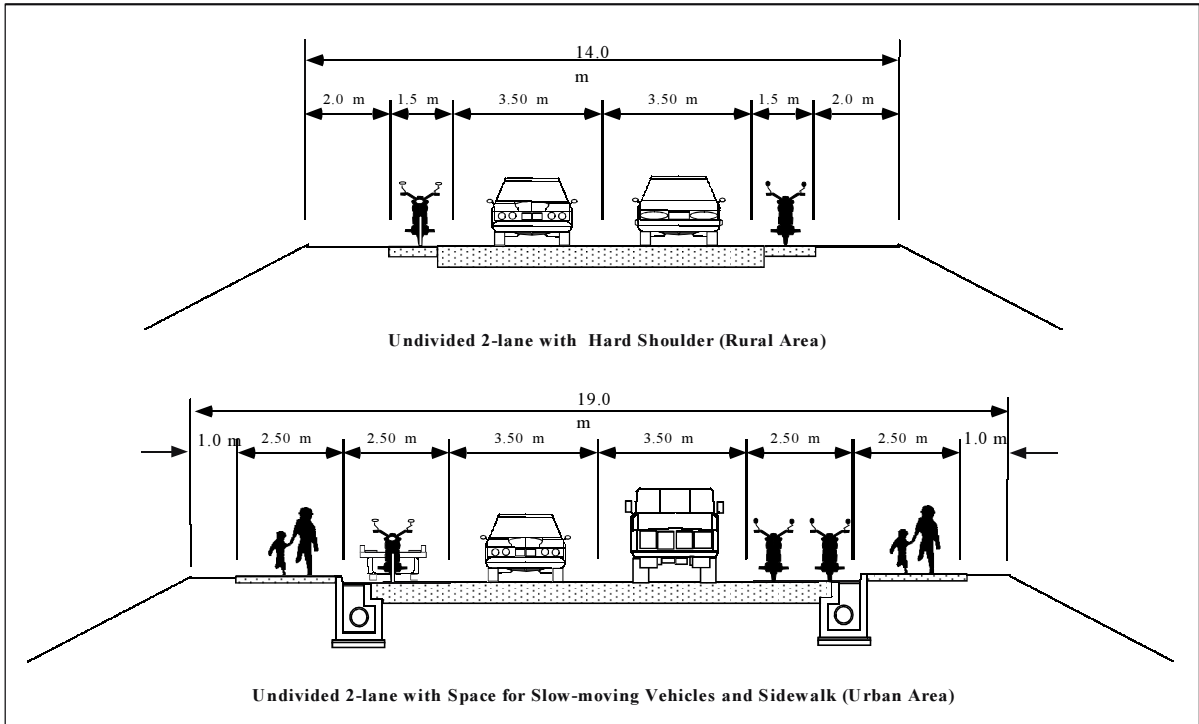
Typical Cross Section to meet Traffic Requirement
